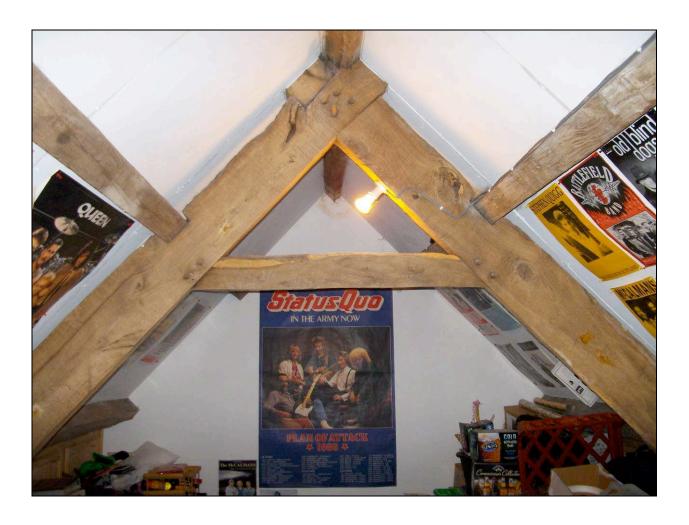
West range; roof (truss 1, photograph taken from the south-west)
